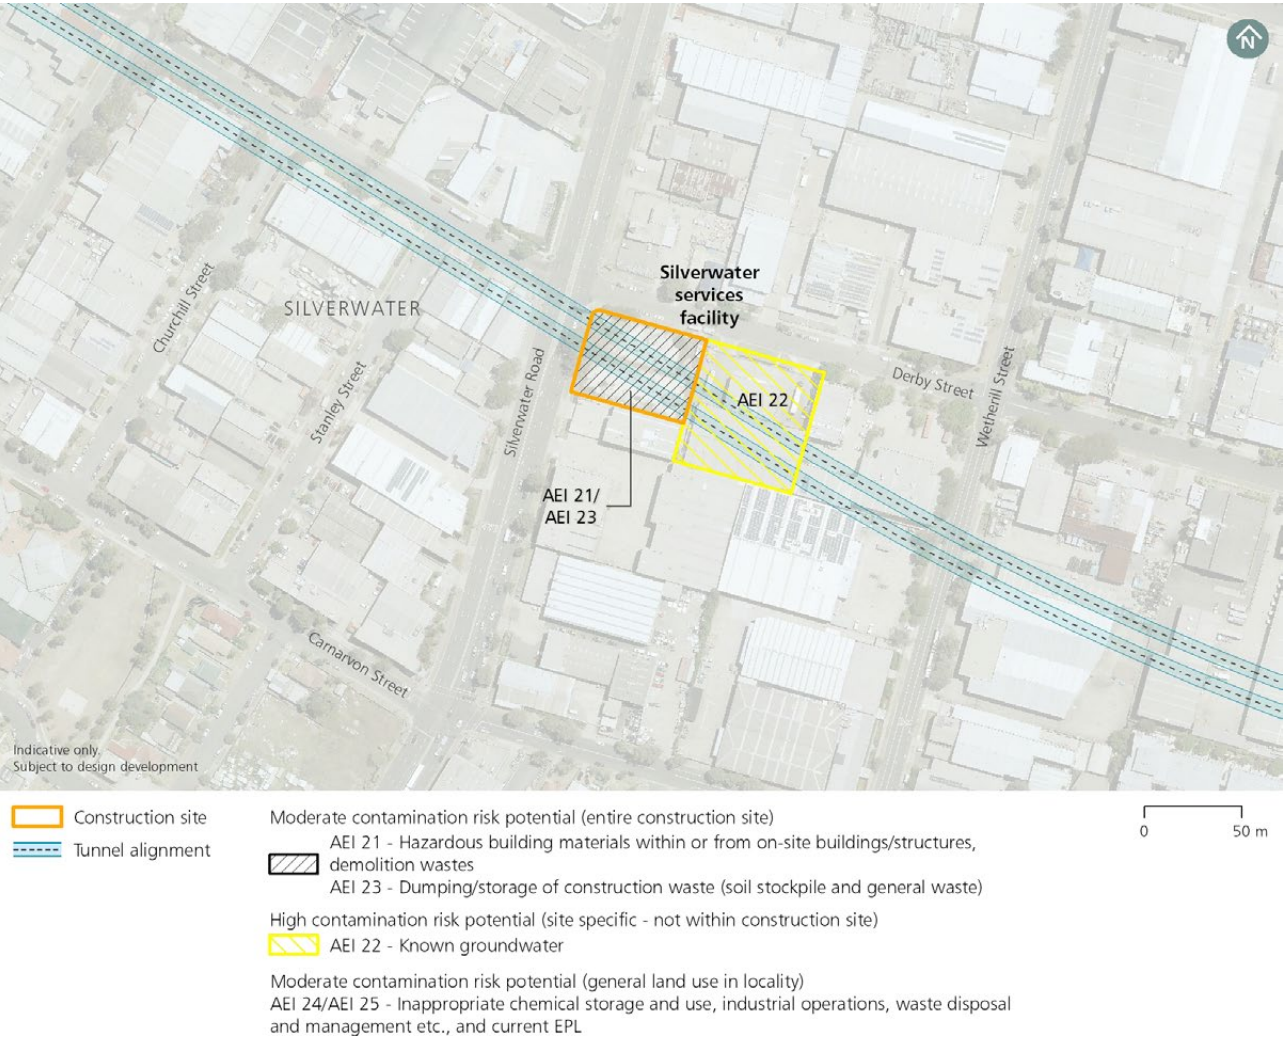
Potential contamination risk (moderate rating and above) – Silverwater services facility construction site and tunnel alignment
